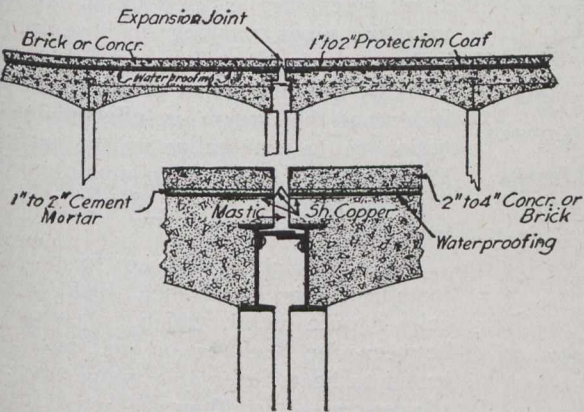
A Waterproofed Expansion Joint in an Arched Roof or Side Wall.
